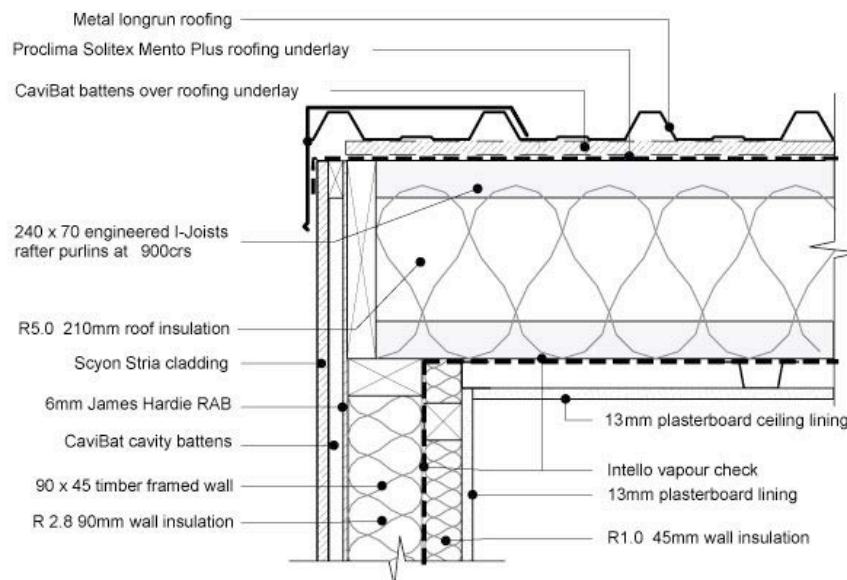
Roof junction to exterior wall barge detail, supplied by S3 Architects Ltd
